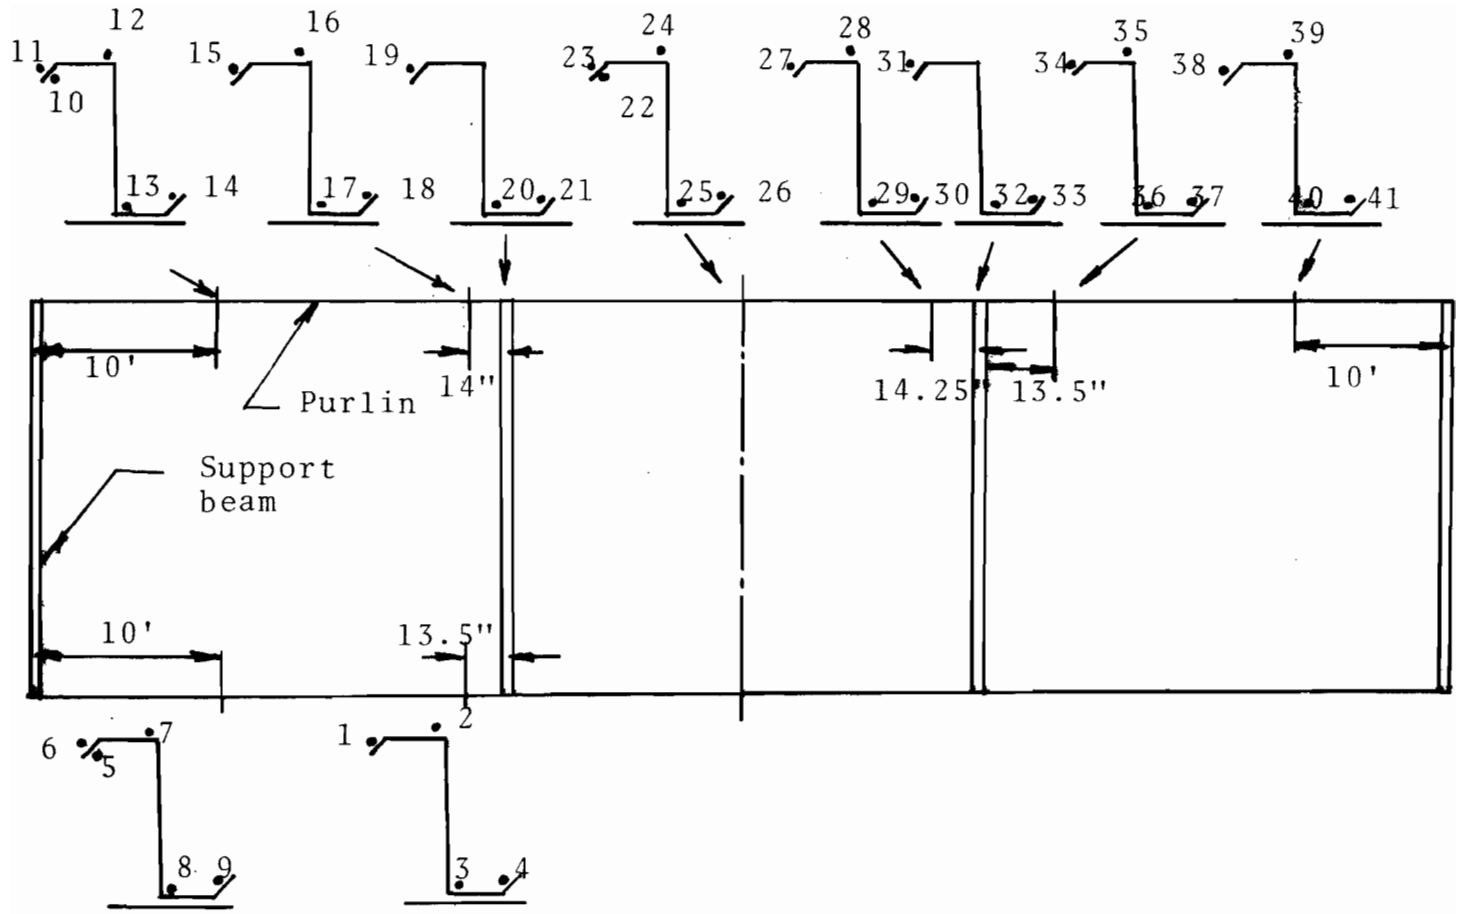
Strain Gage Locations - First Z-Section Purlin Test
